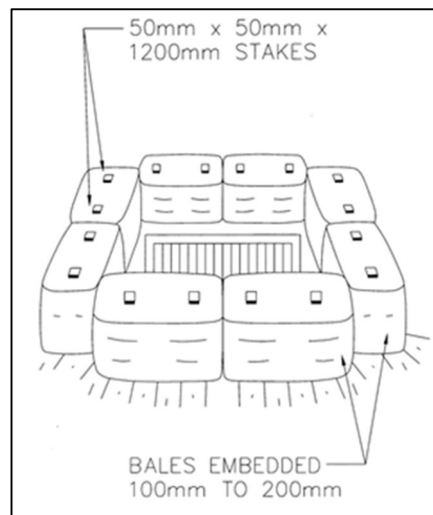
Stormwater Pit Sediment Trap (NTS)
